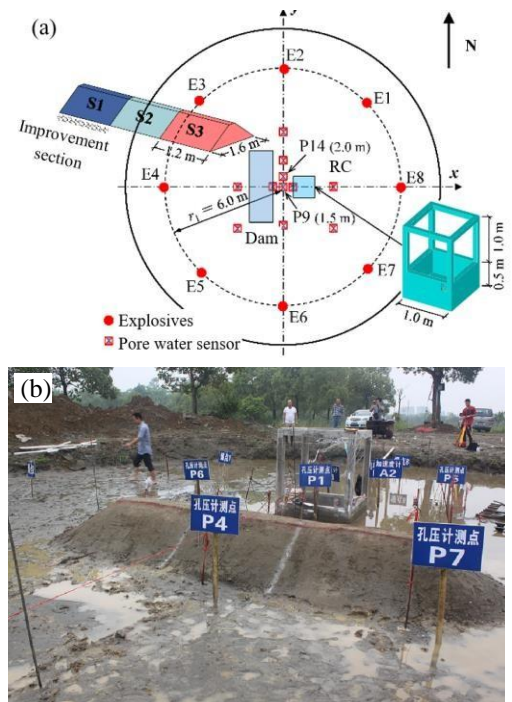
Layout of RC structure and embankment in the blast-induced liquefaction test: (a) Layout of RC structure and embankment in test site; (b) RC structure and embankment before blast
